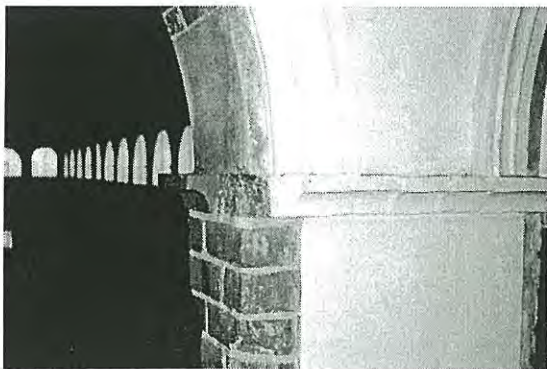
Interior, Landing & Stairs (space FF12). Detail of archway showing damaged/missing projecting brick and plaster cornices.
